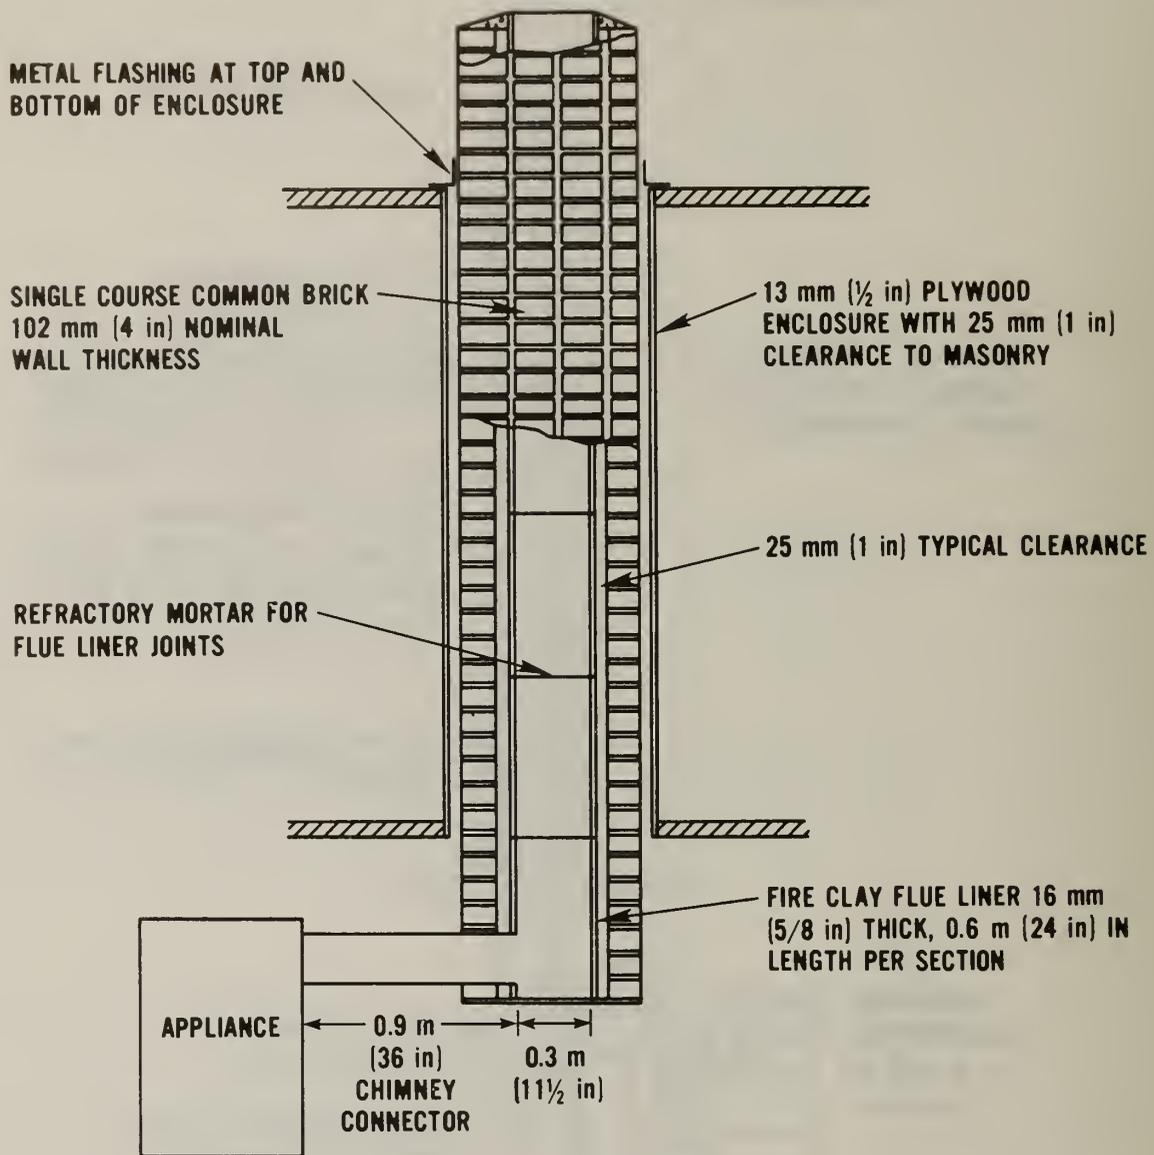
Installation of Masonry Chimney 3 for Chimney Fire Tests.
